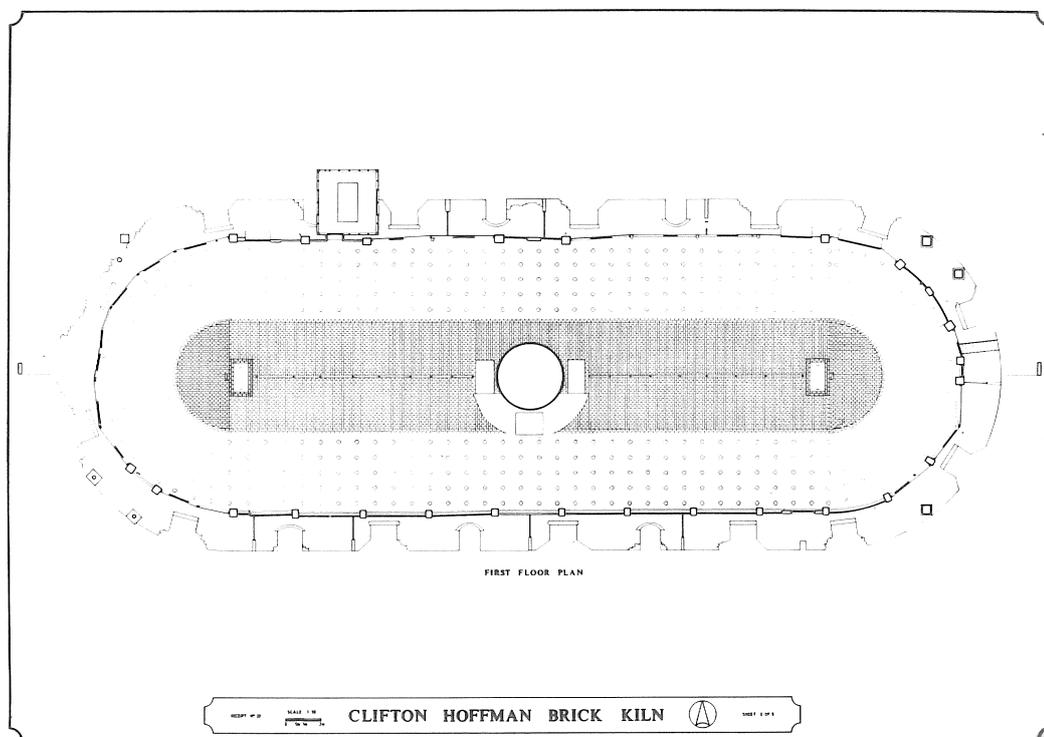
Hoffman Kiln 1, First Floor Plan. Matthew Flinders Measured Drawing Competition.
